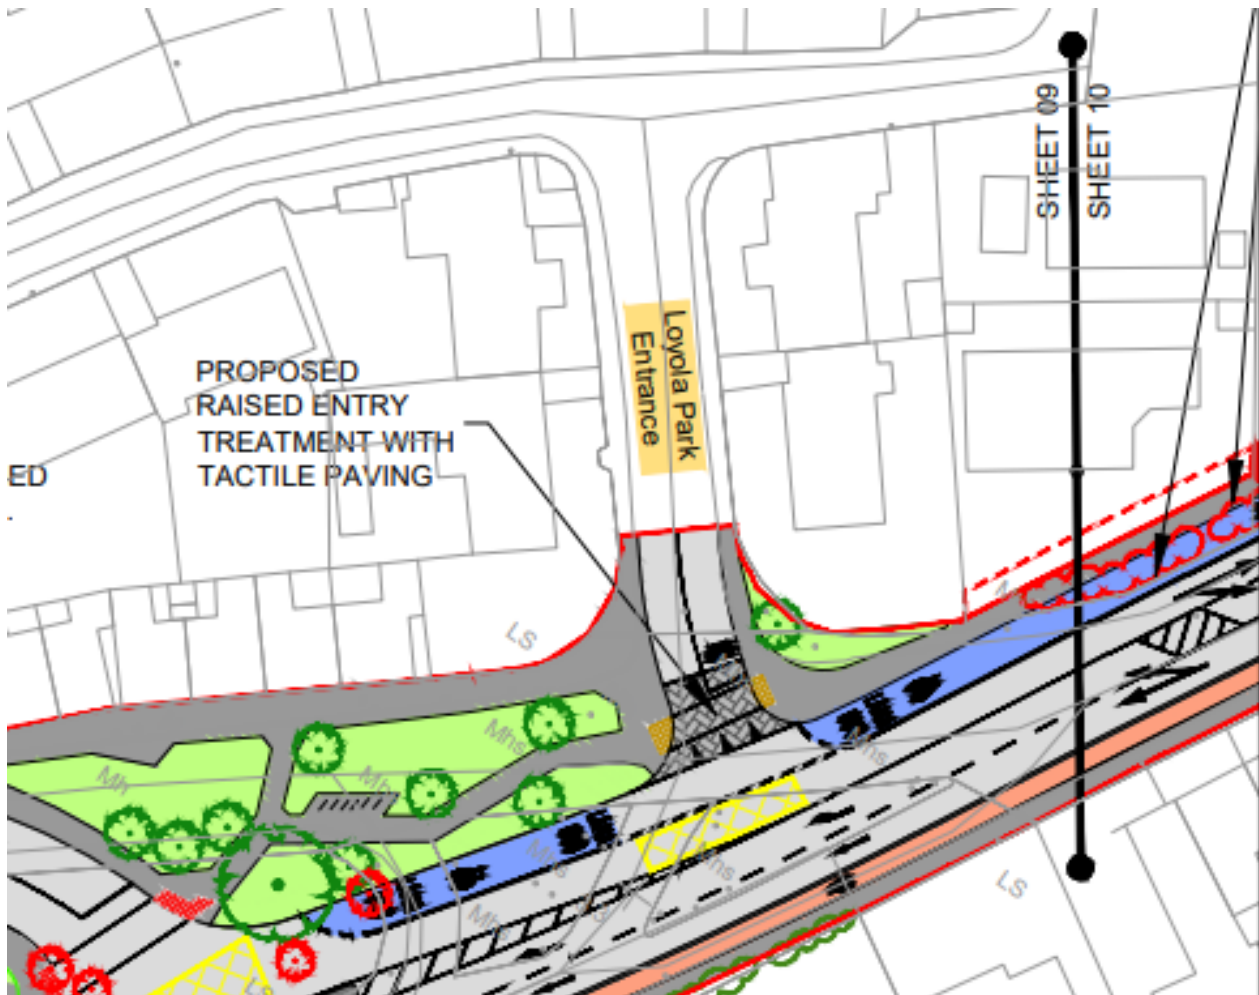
General Arrangement of Proposed Scheme at 139 College Road
